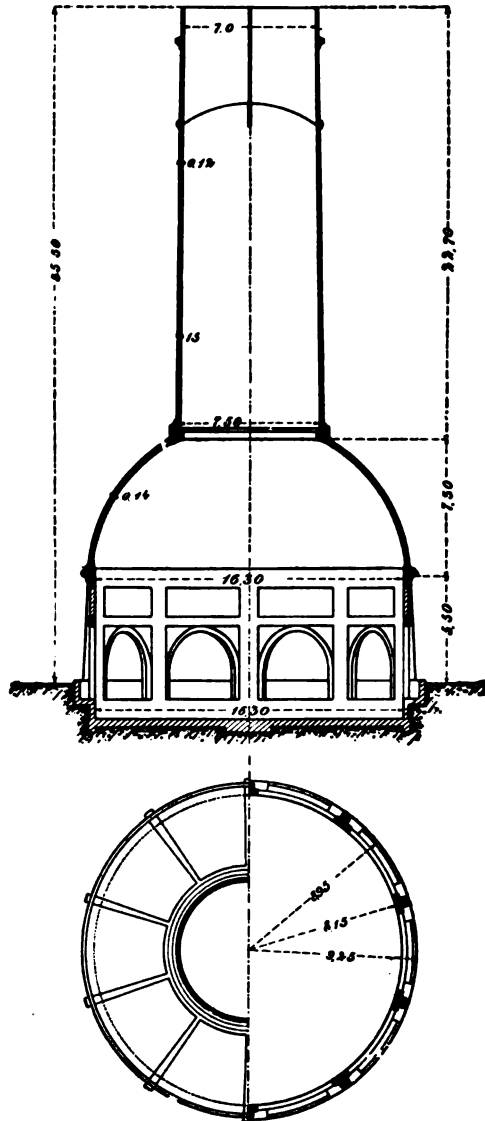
Reinforced concrete cooling tower of the Differdingen Steel Works.
